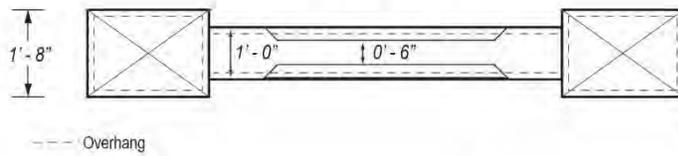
Rail detail of "Welcome to Jacksonville Bridge" built 1926.
